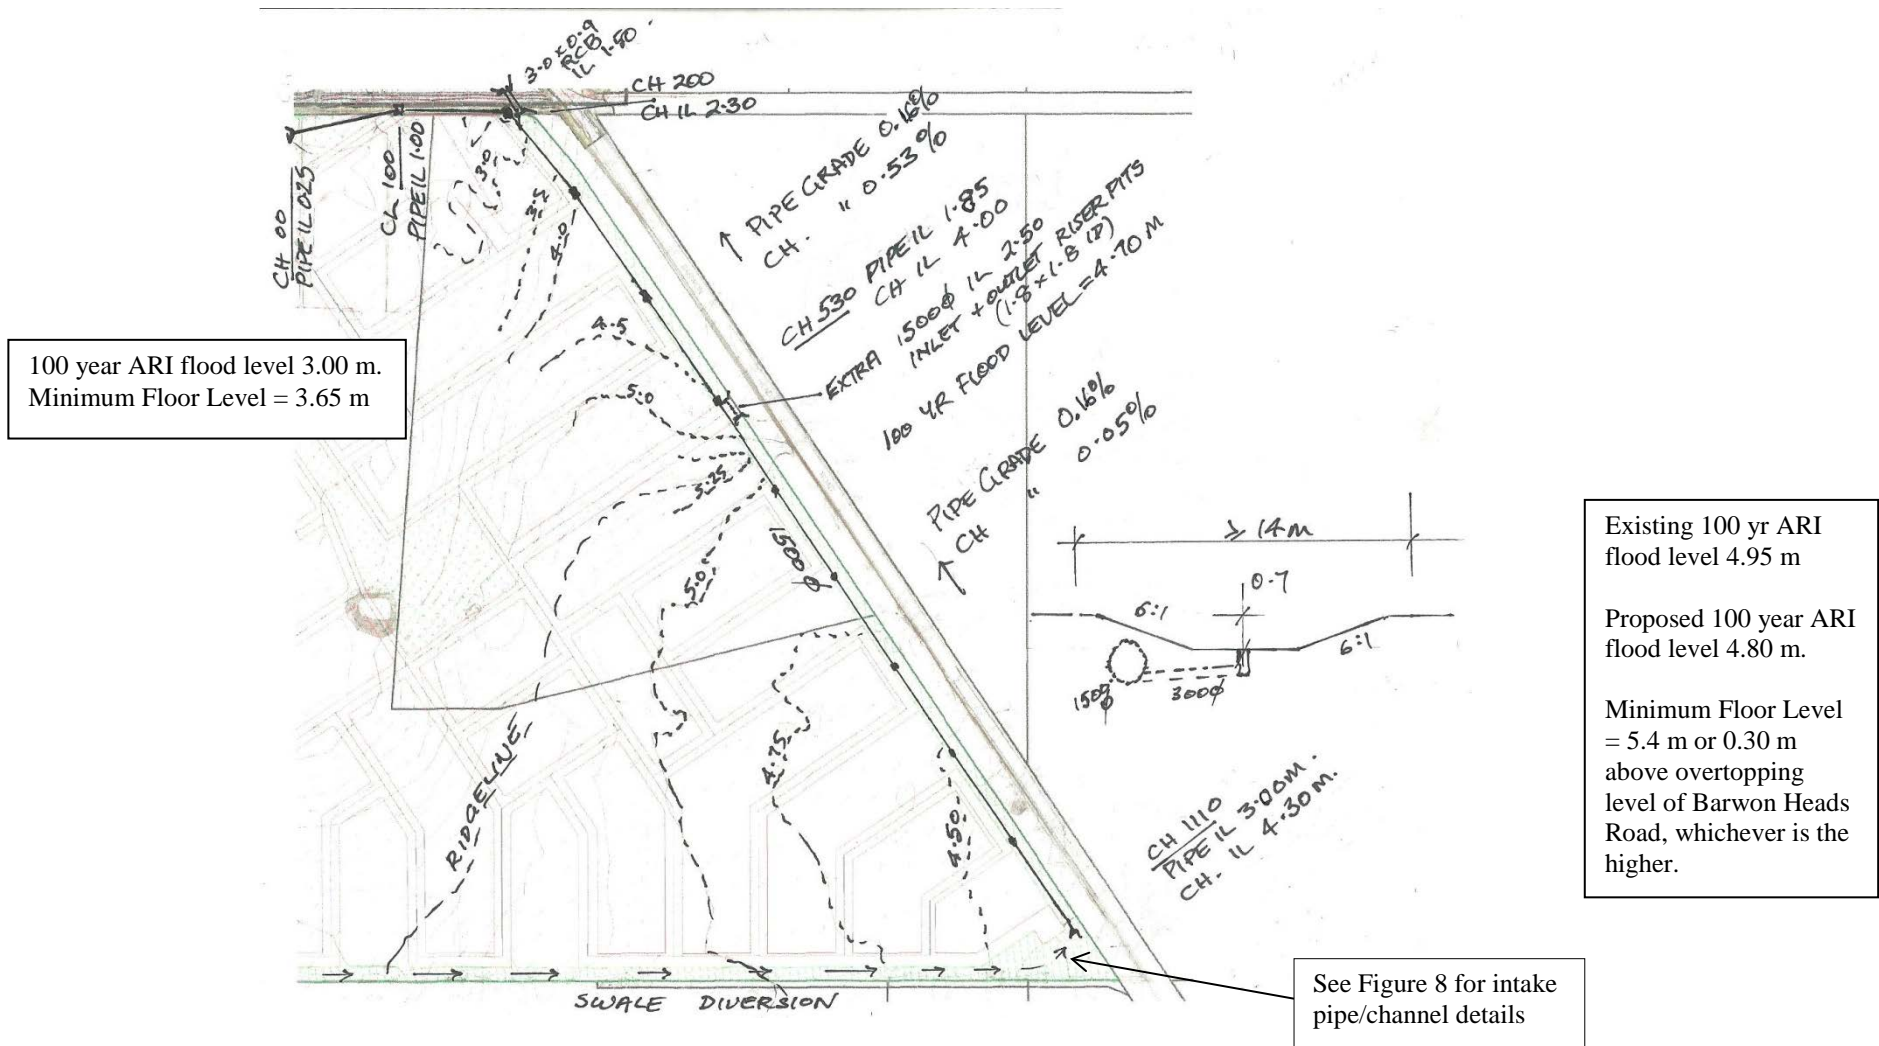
Proposed pipe and channel drainage along Barwon Heads Road
